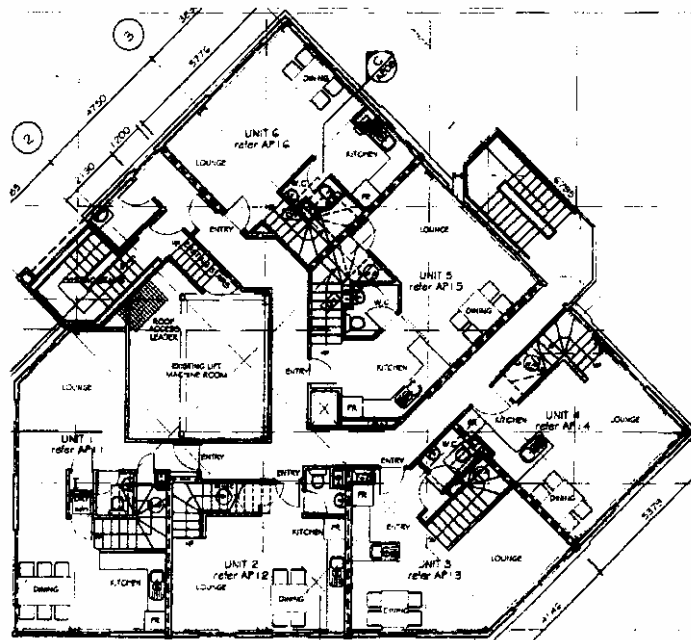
Compliant building – Building C. (Note additional stairwell upper right)
